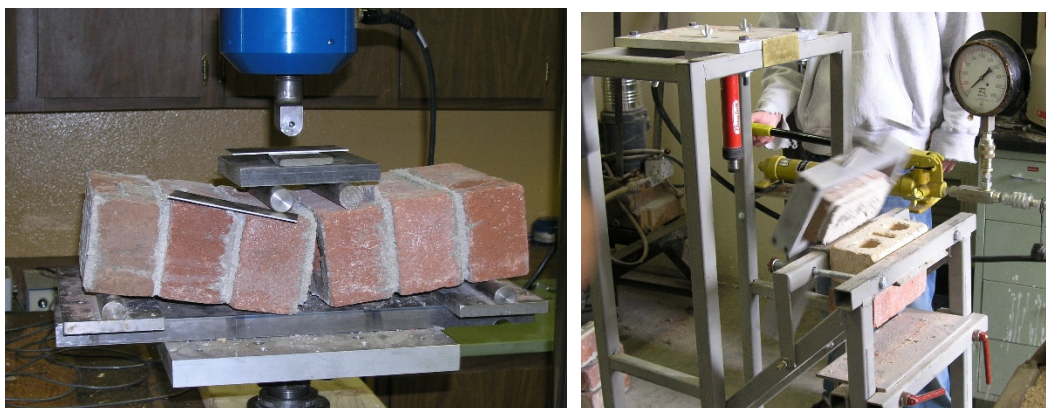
Examples of final failures for beam and bond wrench testing procedures
